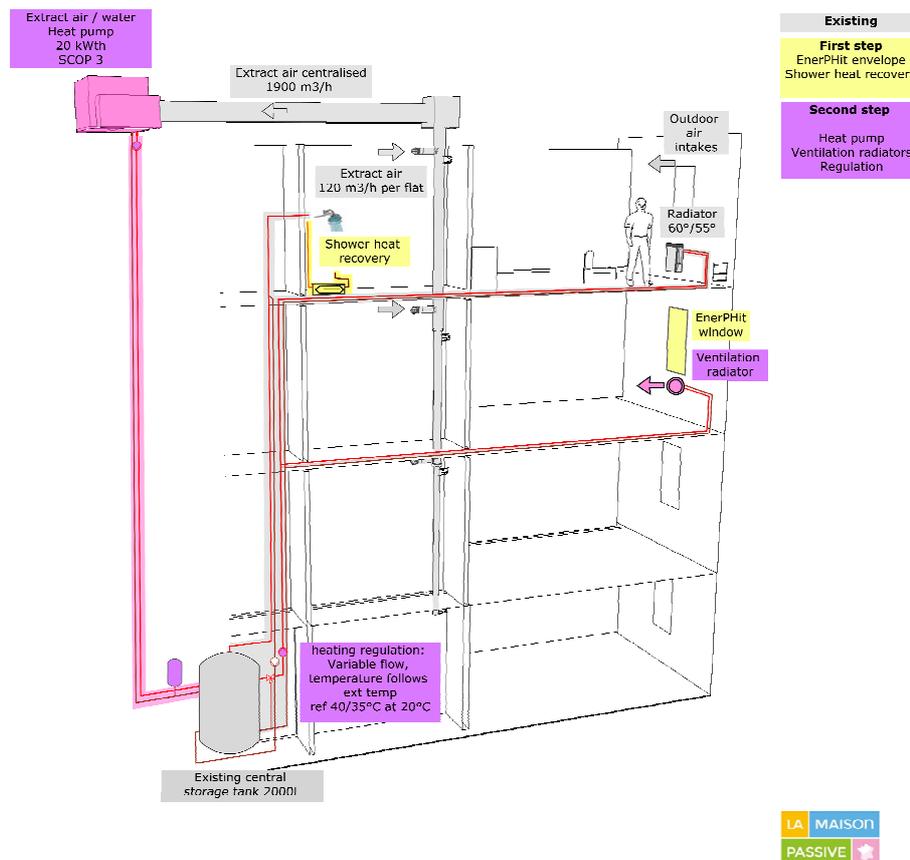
System integration in a 4 storey apartment building, step by step retrofit
